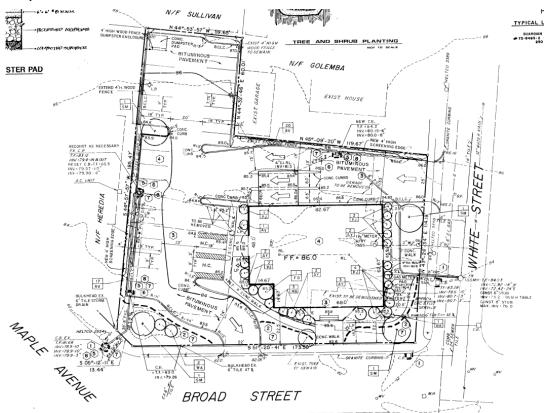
1989 Approved Site Plan – Torres Engineering Inc 1988
